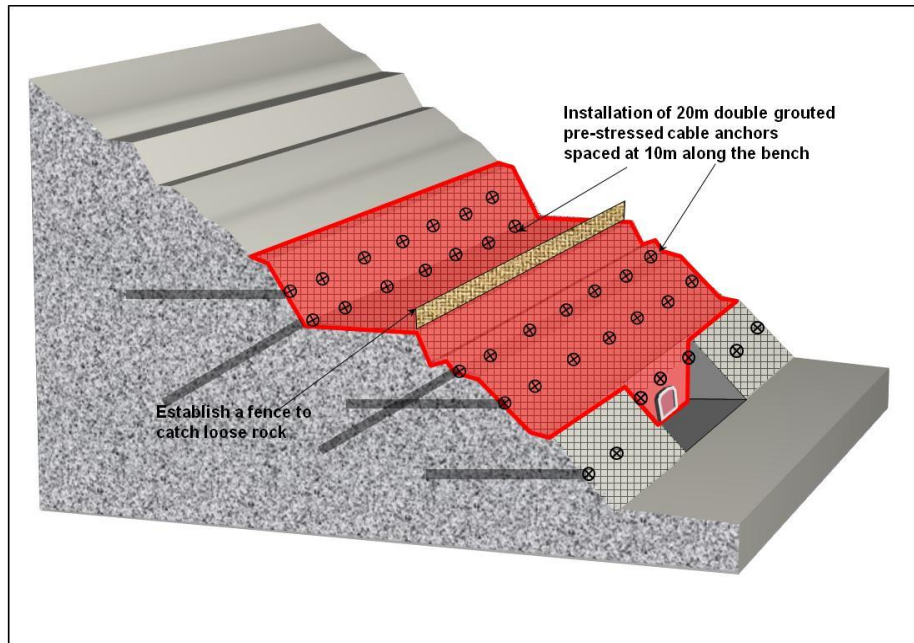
Installation of pre-stressed double grouted cable anchors
